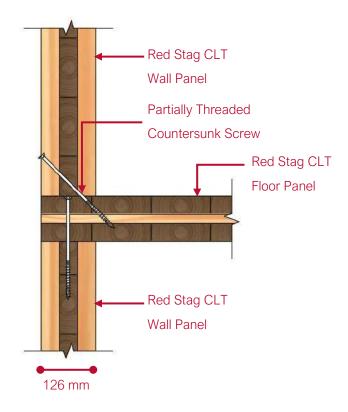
Red Stag CLT wall panel to CLT floor panel.
